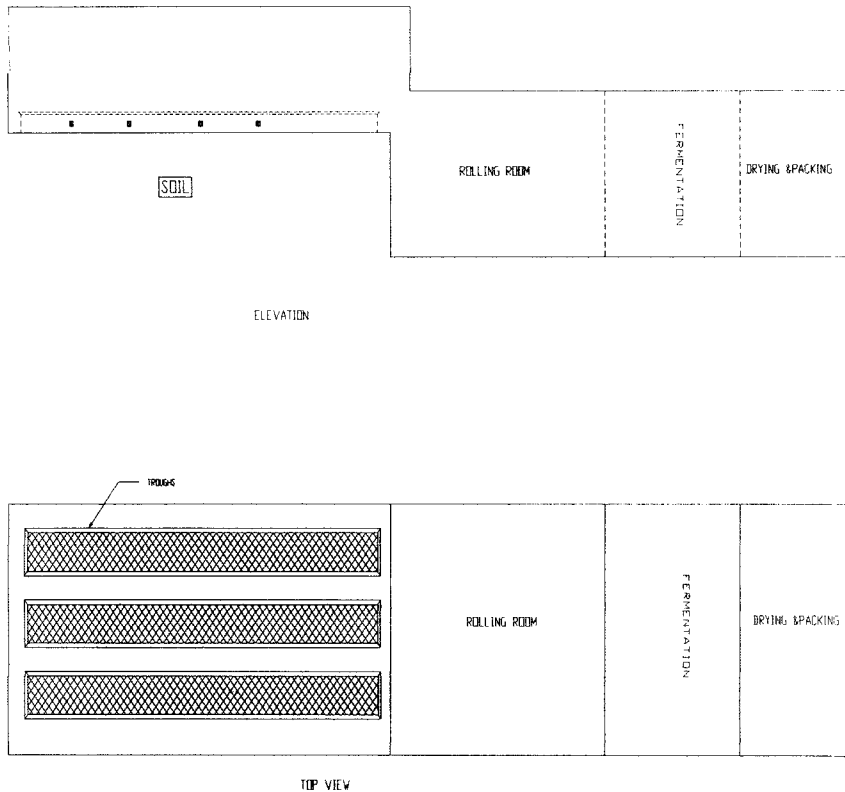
DIAGRAM OF THE BENCHMARKED TEA MANUFACTURING UNIT (M/s Nirsan Plantations-Horizontal Layout)
